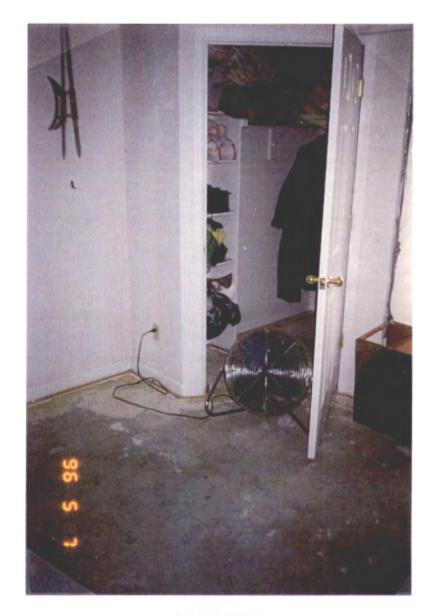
Apartment 103, adolescent's bedroom closet being ventilated.
